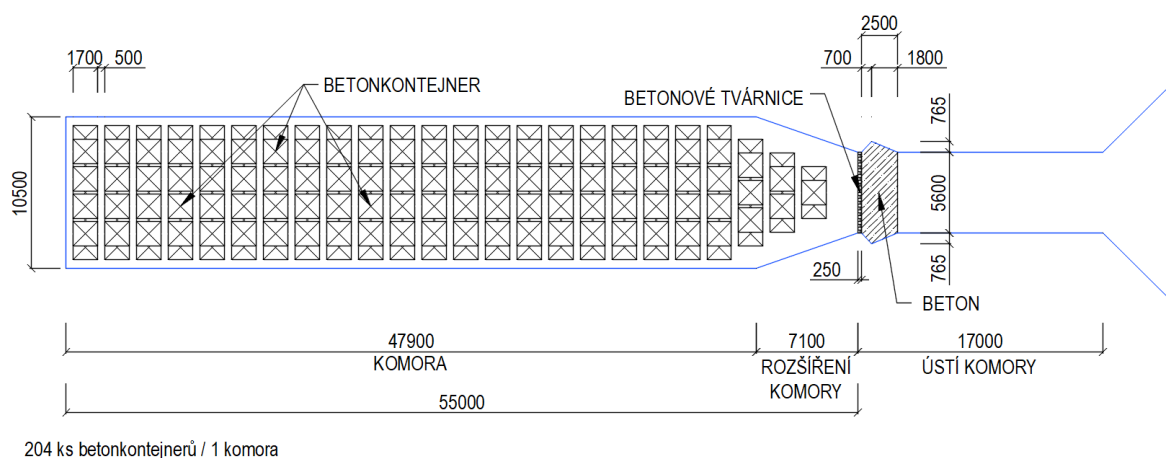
ILW disposal chamber – floor plan (Svoboda et al. 2022)
